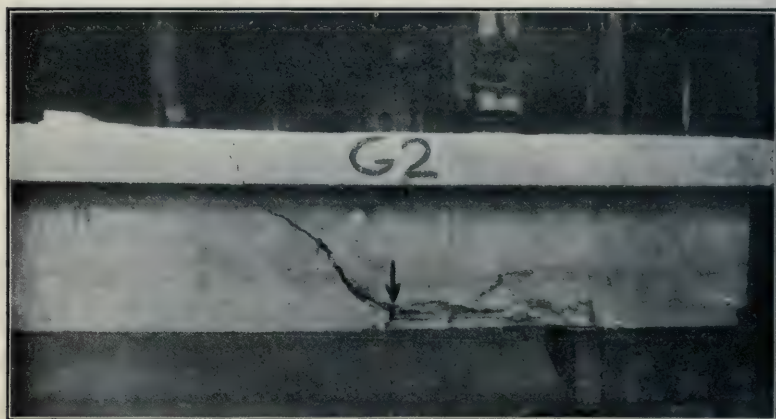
Showing Beam Failure diagonally between center and support.
